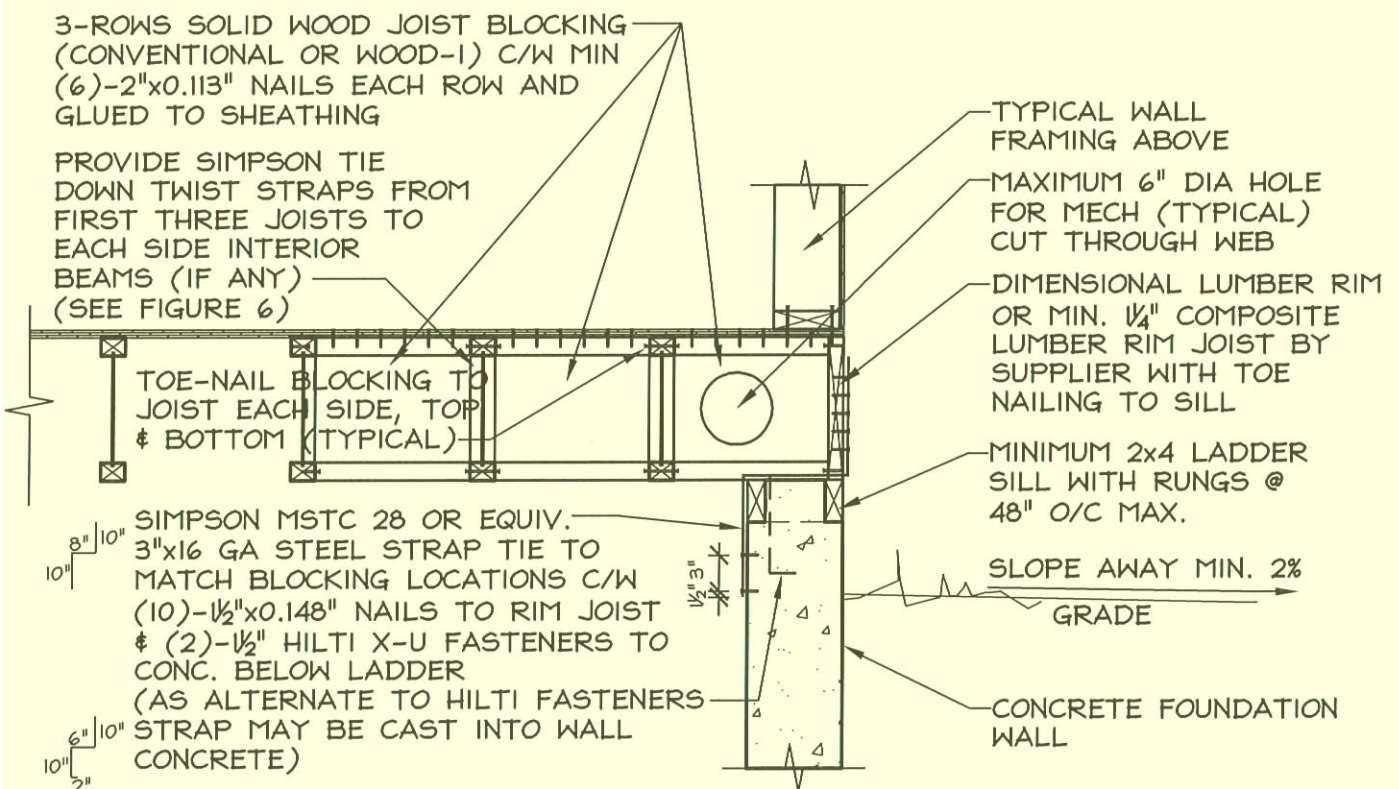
Lateral Connection TYPE 5 (Joists Parallel)
